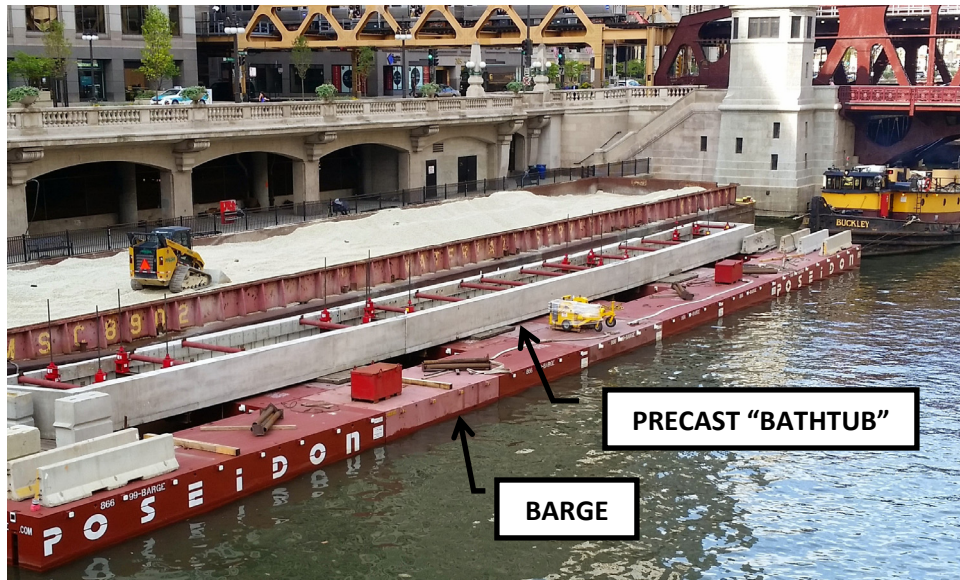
Precast Bathtub Delivery for Underbridge Construction
